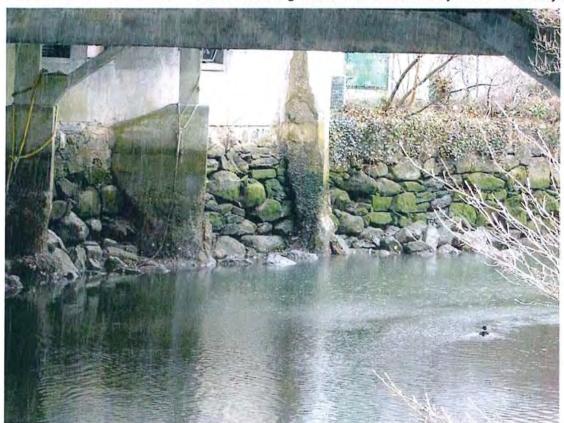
Western bank stone retaining wall located north of the US 1 bridge. View to the north from south of the bridge.
